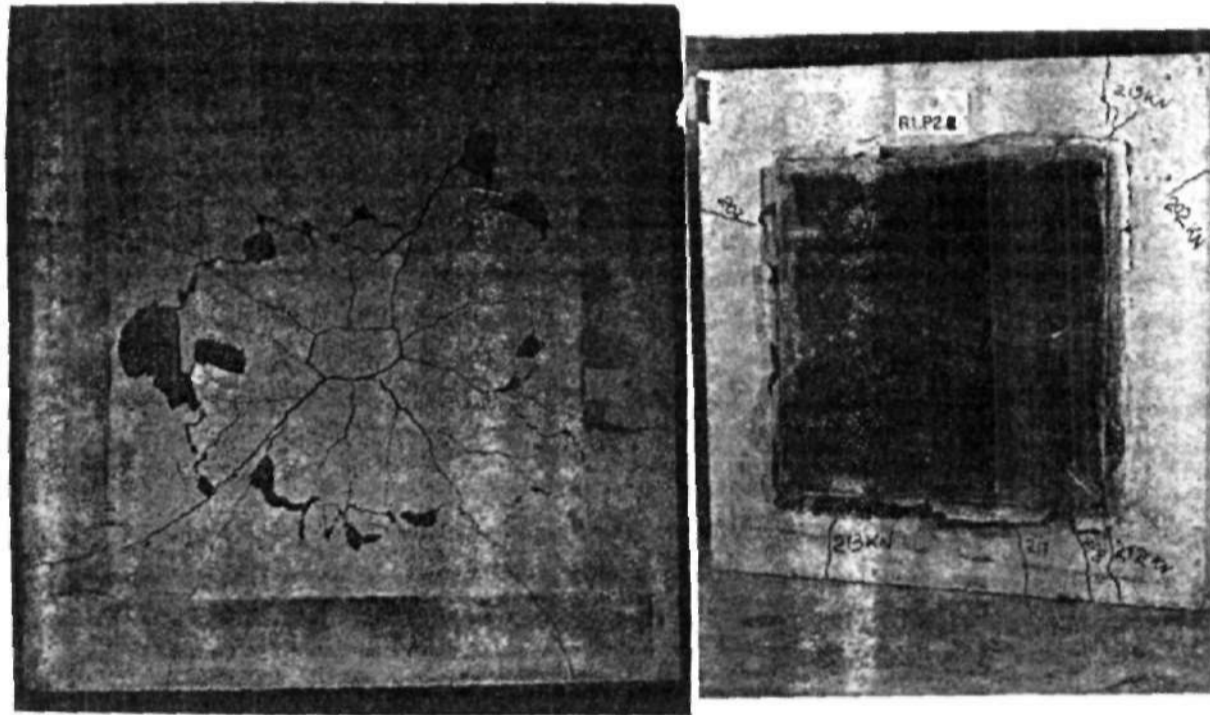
Plate VIII Cracking Behaviour and Failure Modes for Slabs Test Series (A) through (D)
